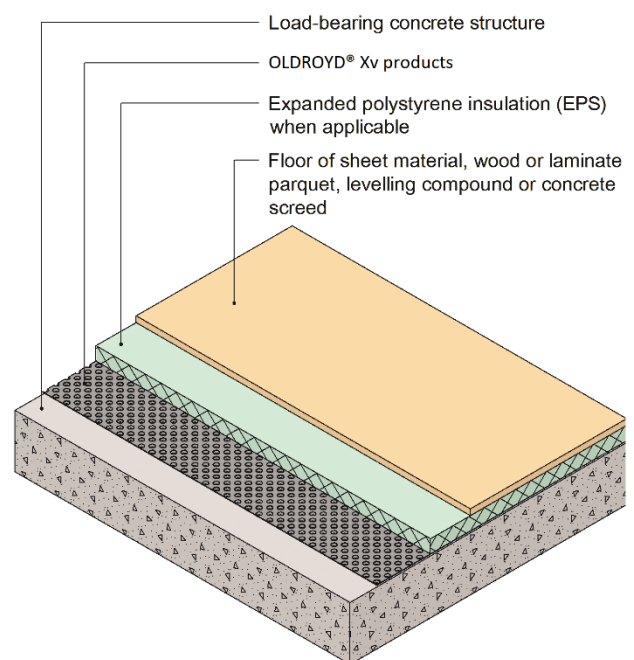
Example for a floating floor construction with OLDROYD® Xv products.
